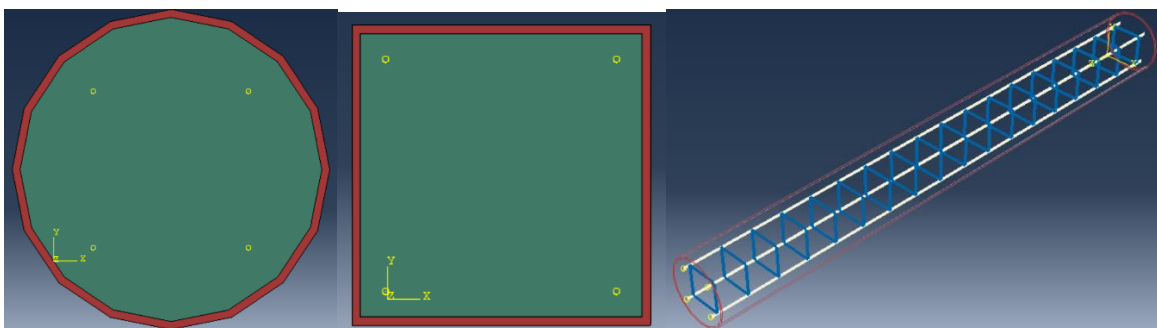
Circular and square concrete filled steel tube column longitudinal reinforcement
